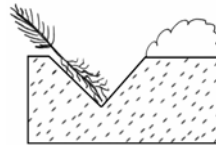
B: Break bundles and spread plants along the trench wall with 2-3 inches between each plant.
